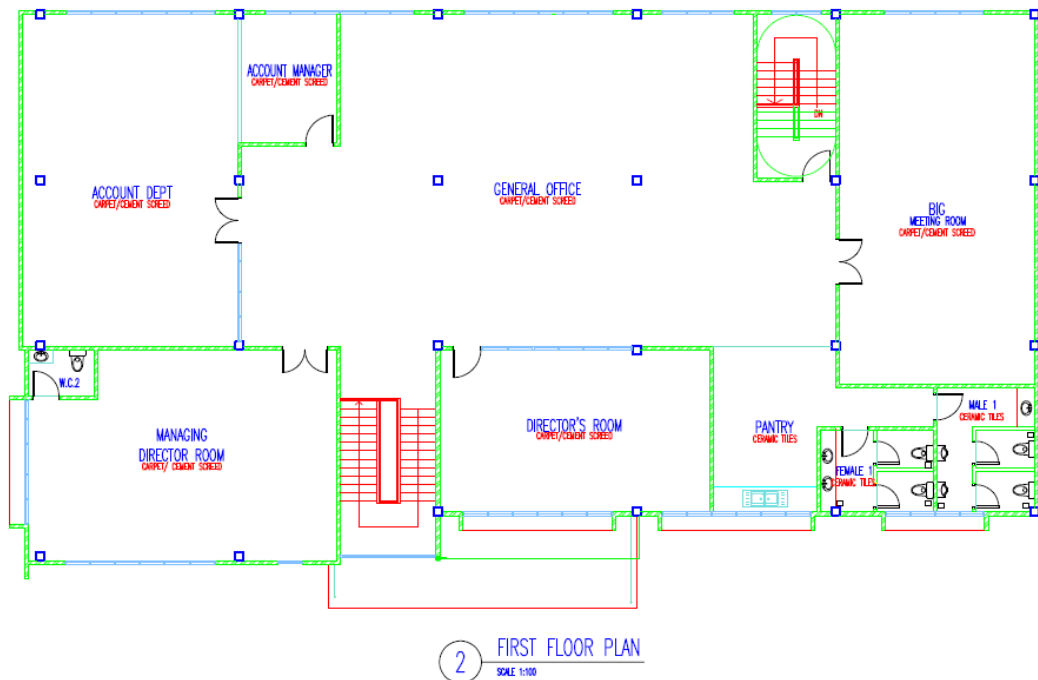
Building Components and Its Arrangement (First Floor)
